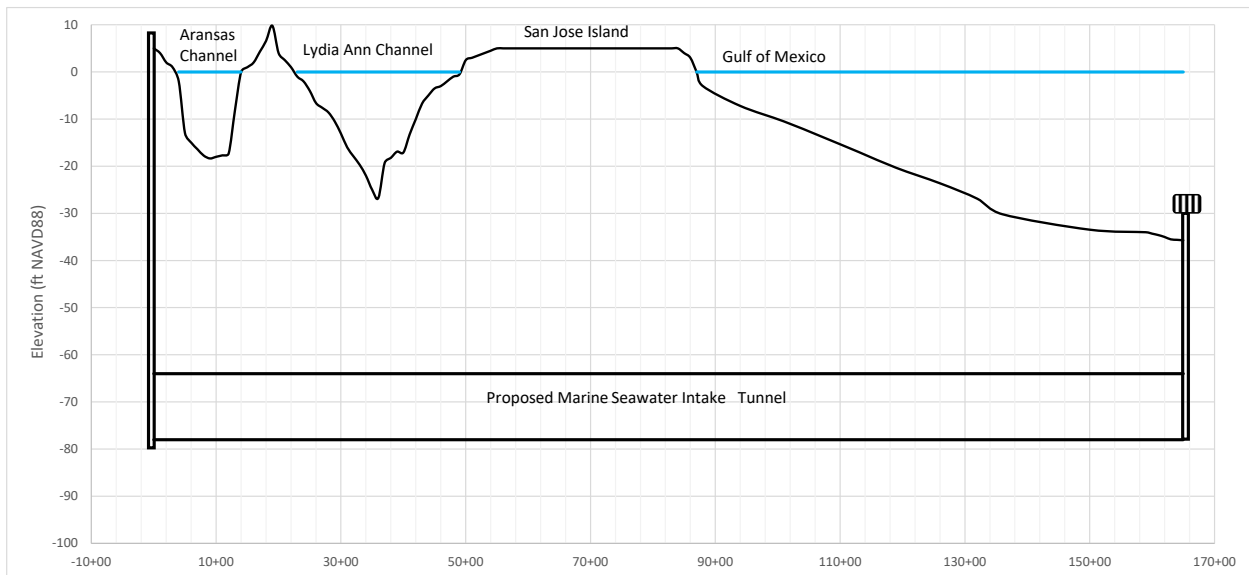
Profile of Proposed Seawater Intake Tunnel
